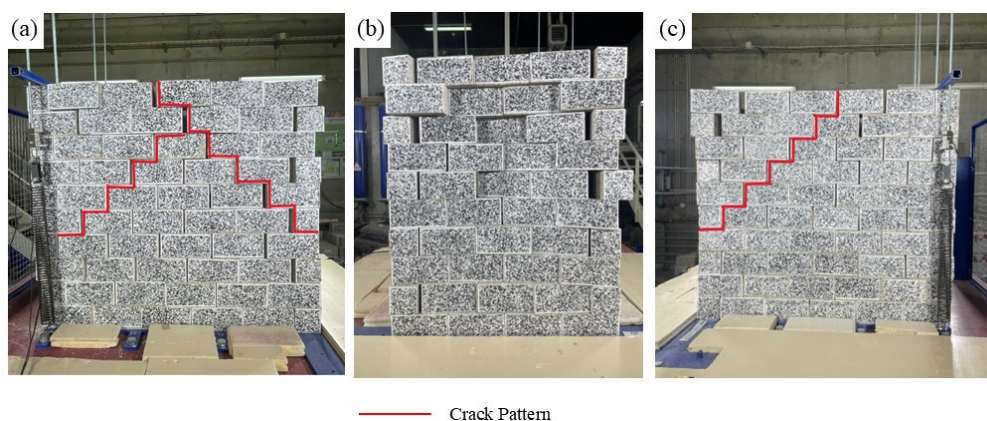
Observed damage before collapse at 1.14 g: (a) crack opening due to in-plane rocking of two macro-blocks in west return wall, (b) displaced blocks in OOP façade shows bending and opening of return walls, and (c) large displacements in east return wall along with crack showing formation of macro-blocks.
